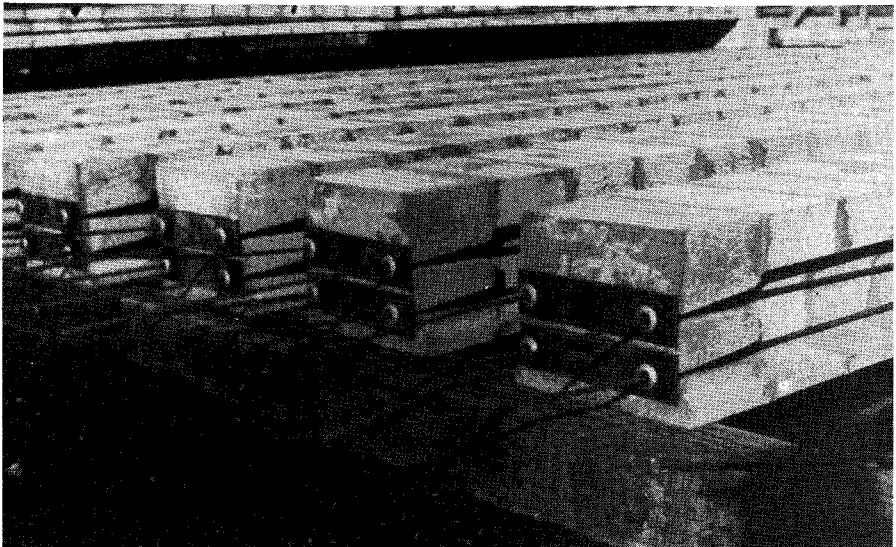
A 16-in. (406 mm) bridge beam with bonded strands.
